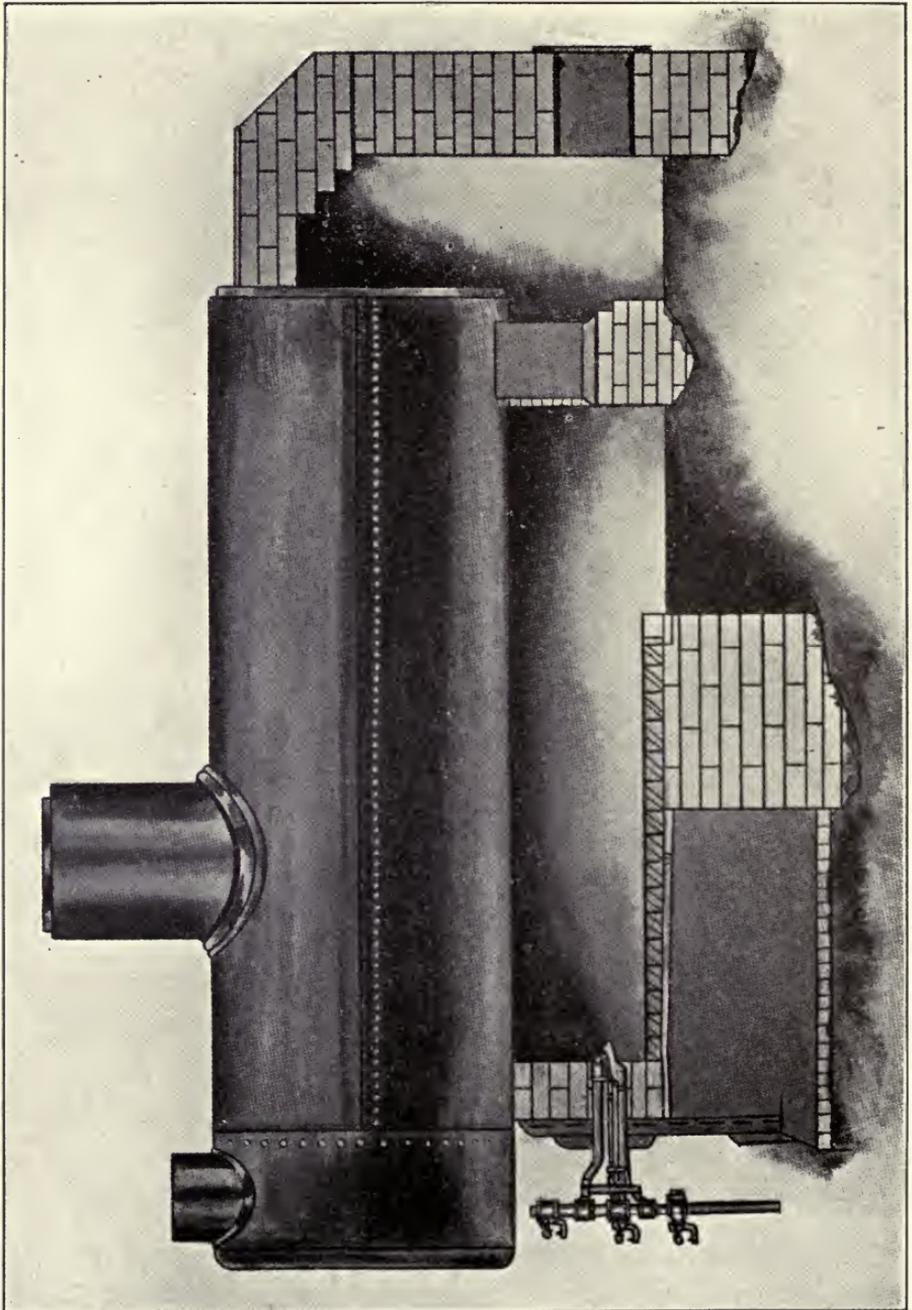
Return Tubular Boiler Equipment. "High Setting."
